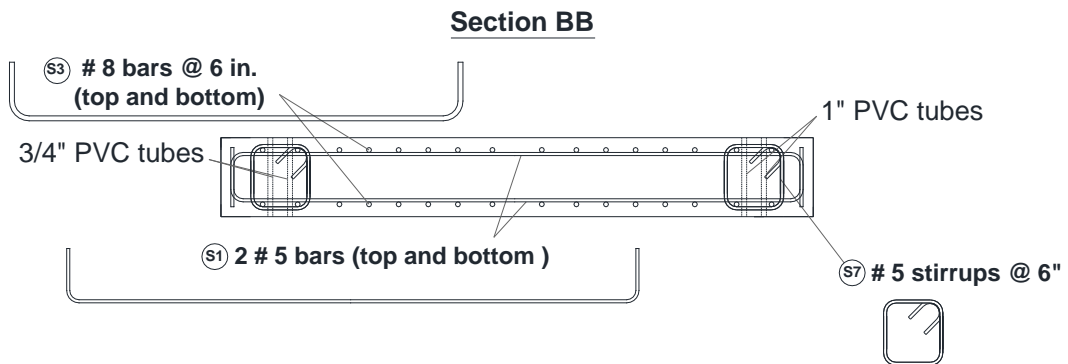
Elevation view of slab reinforcement at Section BB for Specimen #2
